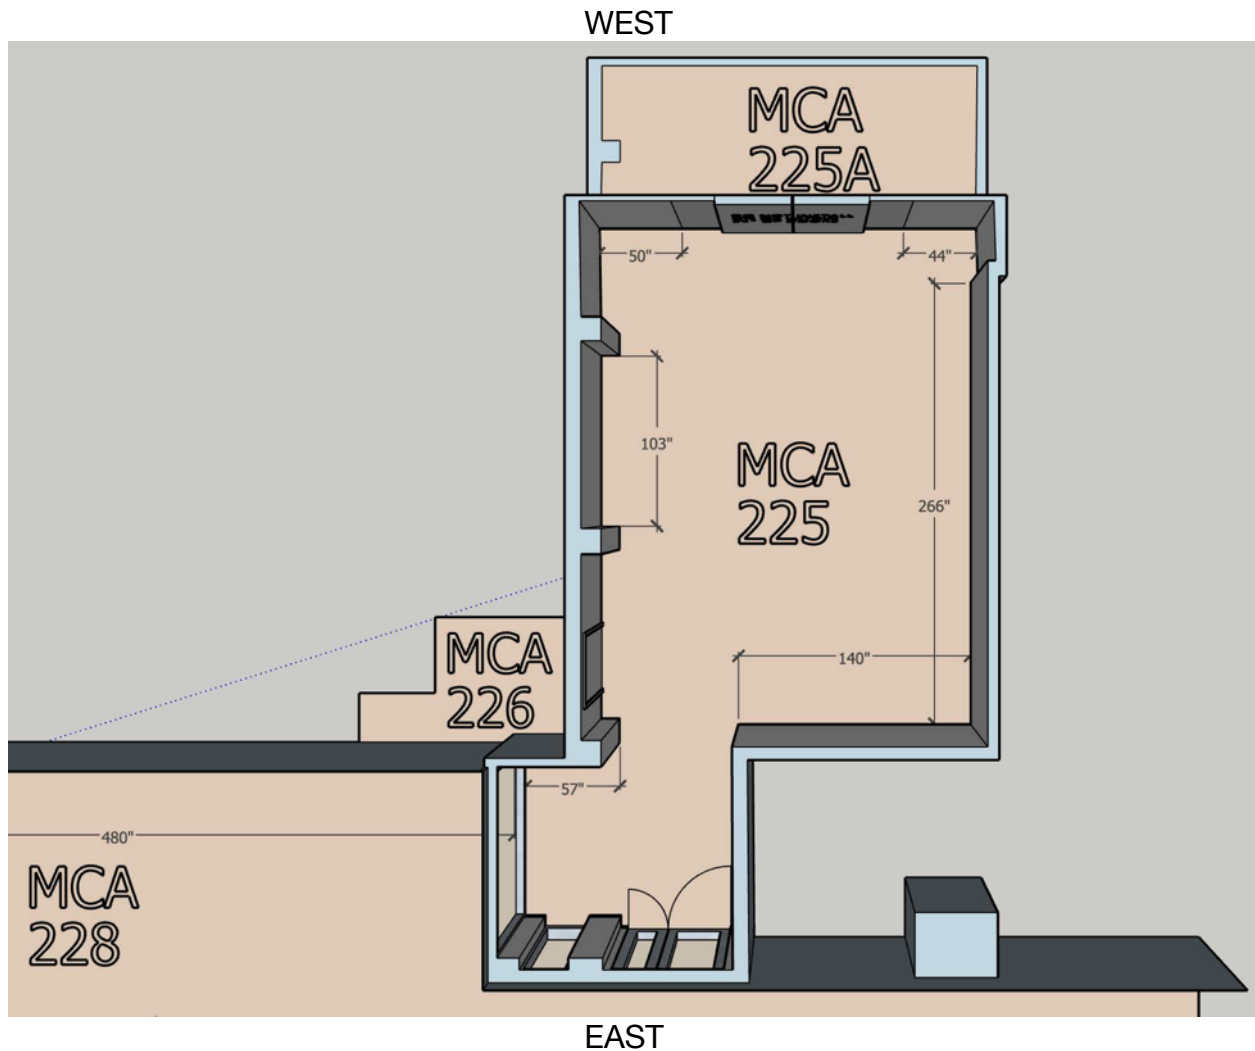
Ada Slight Gallery Floorplan (from OCADU, Ada Slight Exhibition Agreement)
